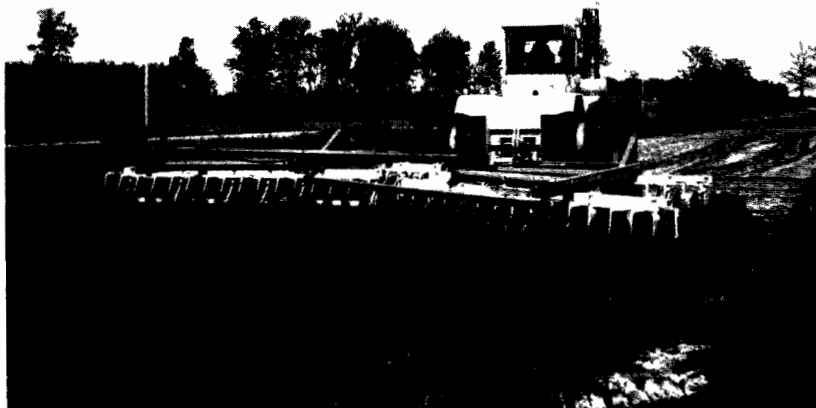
Swing-type disc in tow by a four-wheel drive tractor
